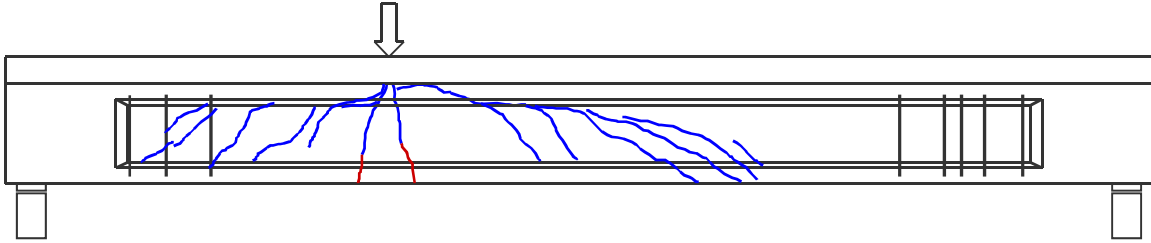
Crack pattern girder I2B (initial crack shown in red)
